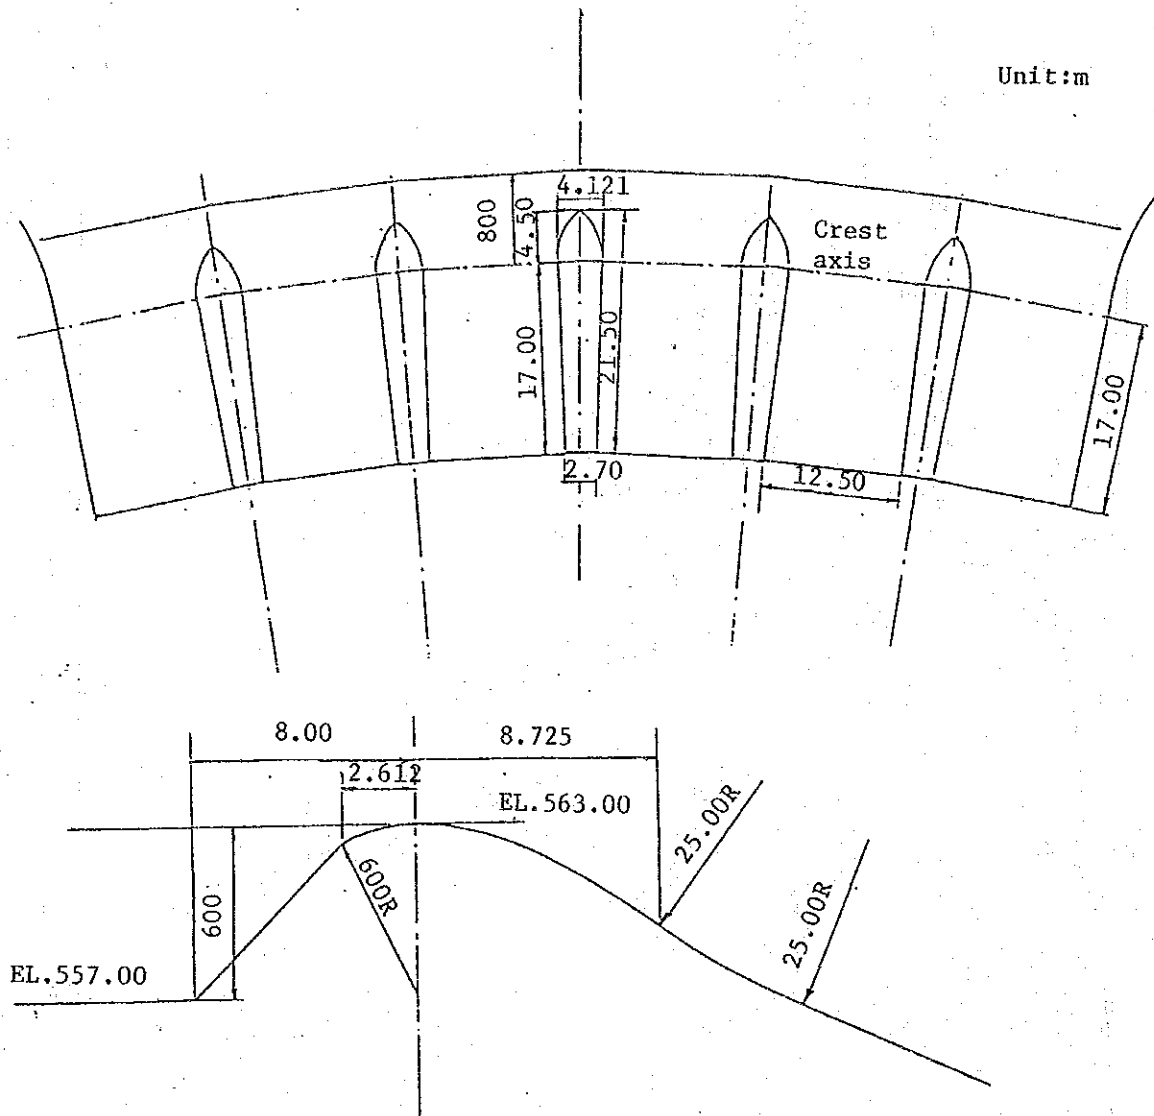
Plan and Cross Section of Binga Spillway Crest
